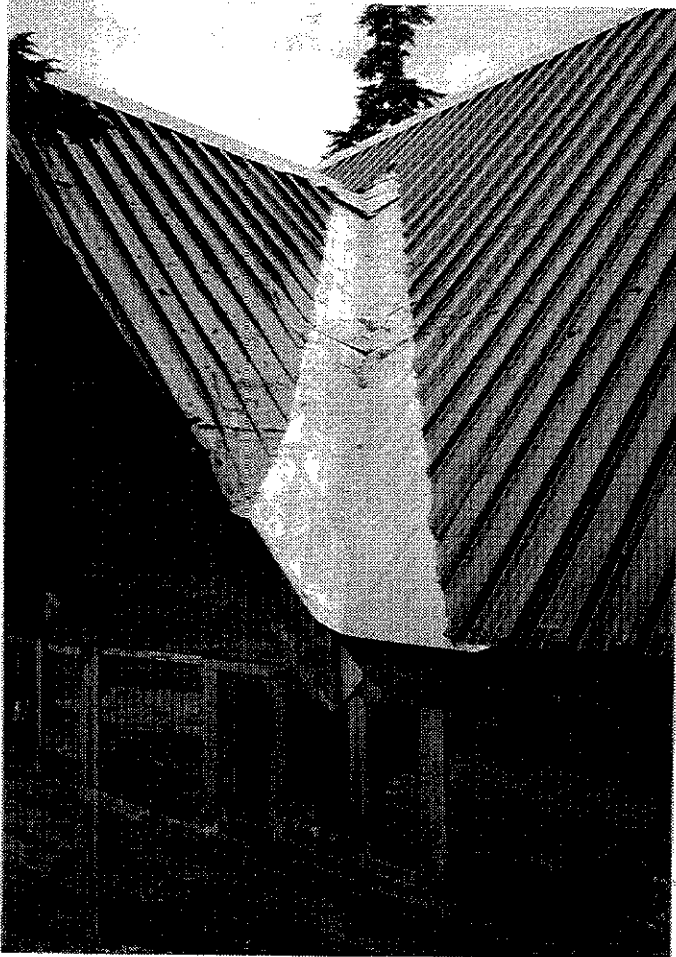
Snow sliding down the larger roof on right side has damaged metal roofing in valley as it moved downwards.
